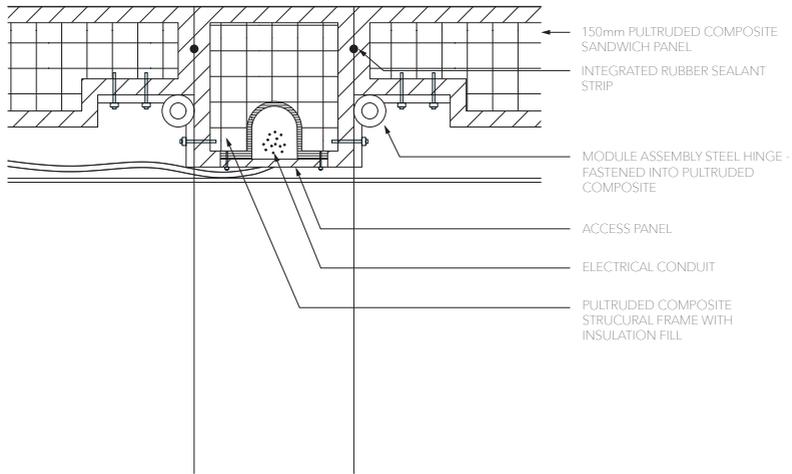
Detail B: Electrical Conduit and Centre Structural Element
